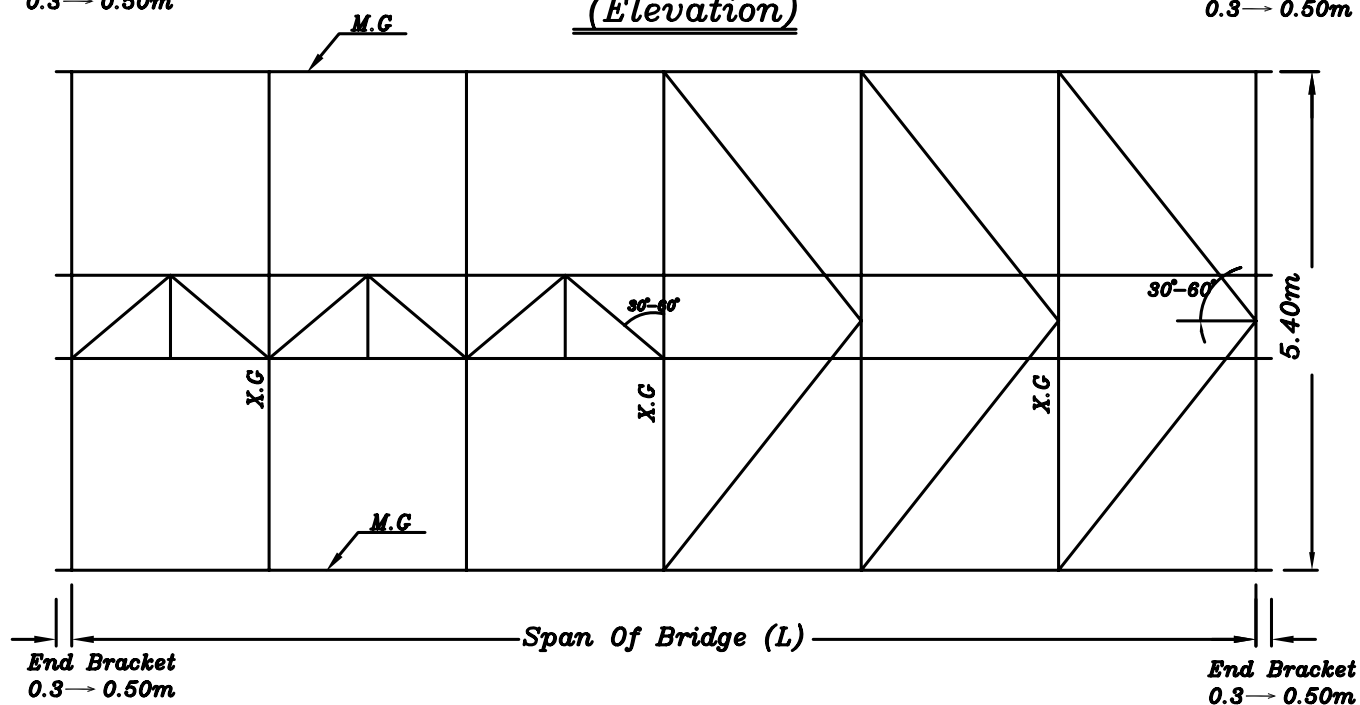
# PLATE GIRDER PONY BRIDGE RAIL WAY SINGLE TRACK
